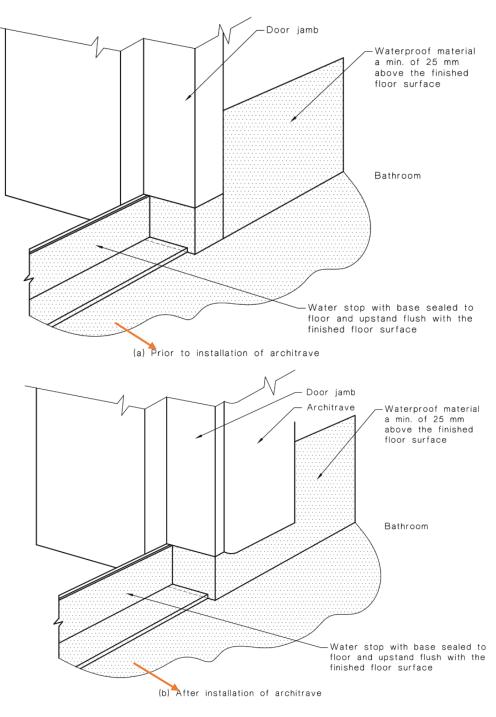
TYPICAL BATHROOM DOOR DETAIL FOR WHOLE BATHROOM WATERPROOFING
